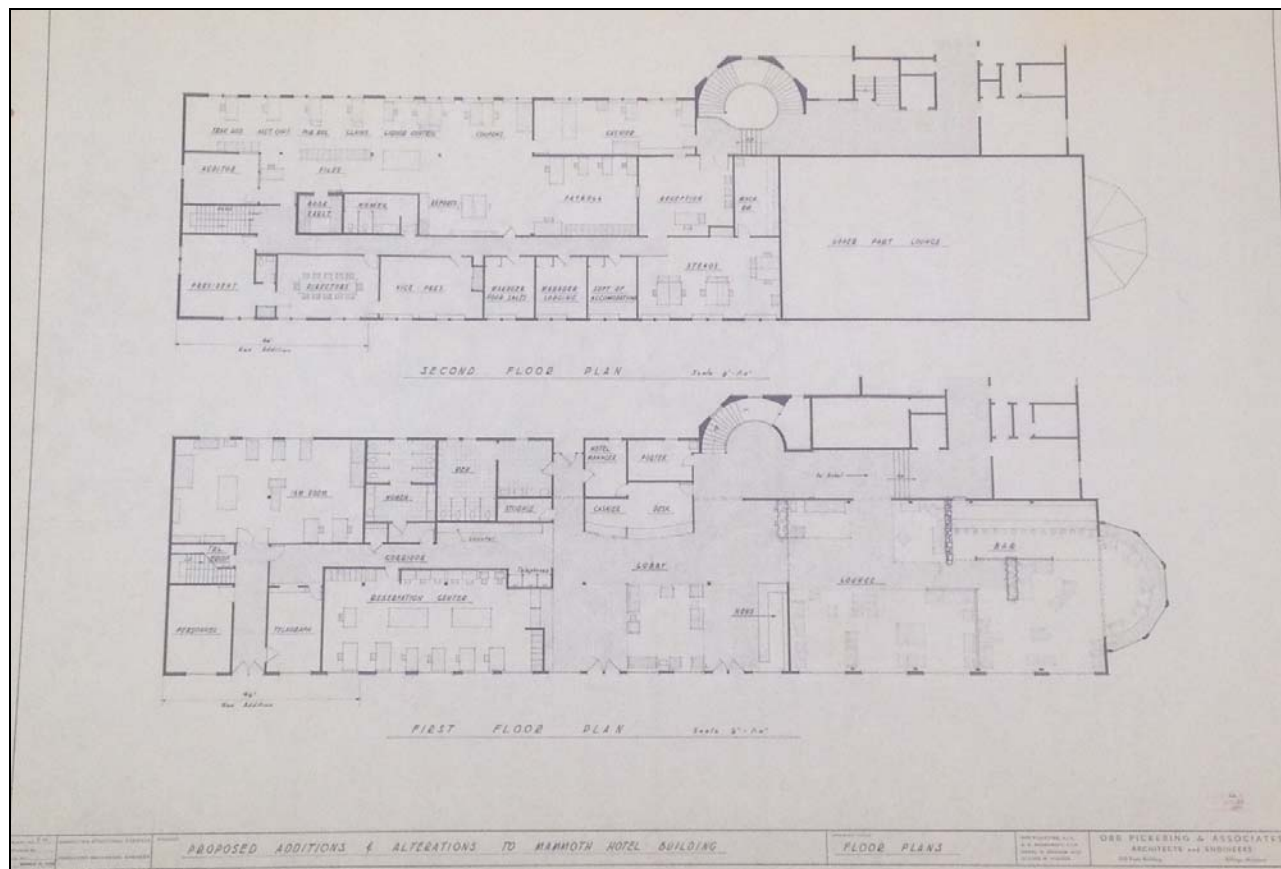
Sheet 1 First Floor Plan, "Proposed Additions and to Mammoth Hotel Building." File 428, Subseries A: Architectural Drawings 1903-2006 & undated, Series V: Facilities and Maintenance 1903-2007 & undated, Maps and Drawing Collection (Catalogue No. YELL 145676), NARA YELL.
